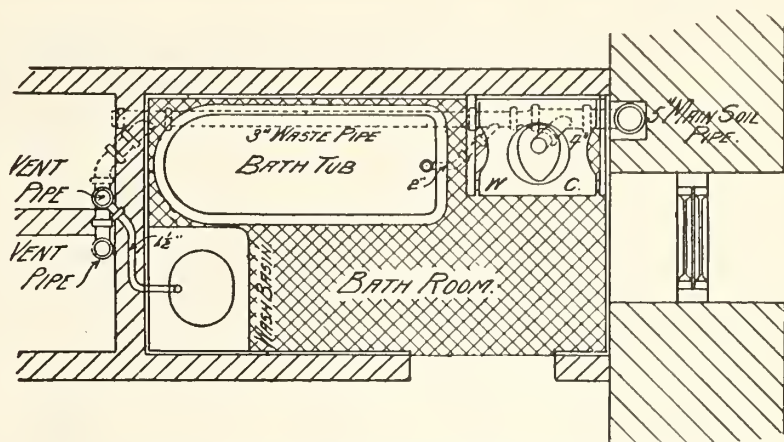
Plan of bathroom (the section and arrangement of the plumbing for same are shown in Fig. 95.)
